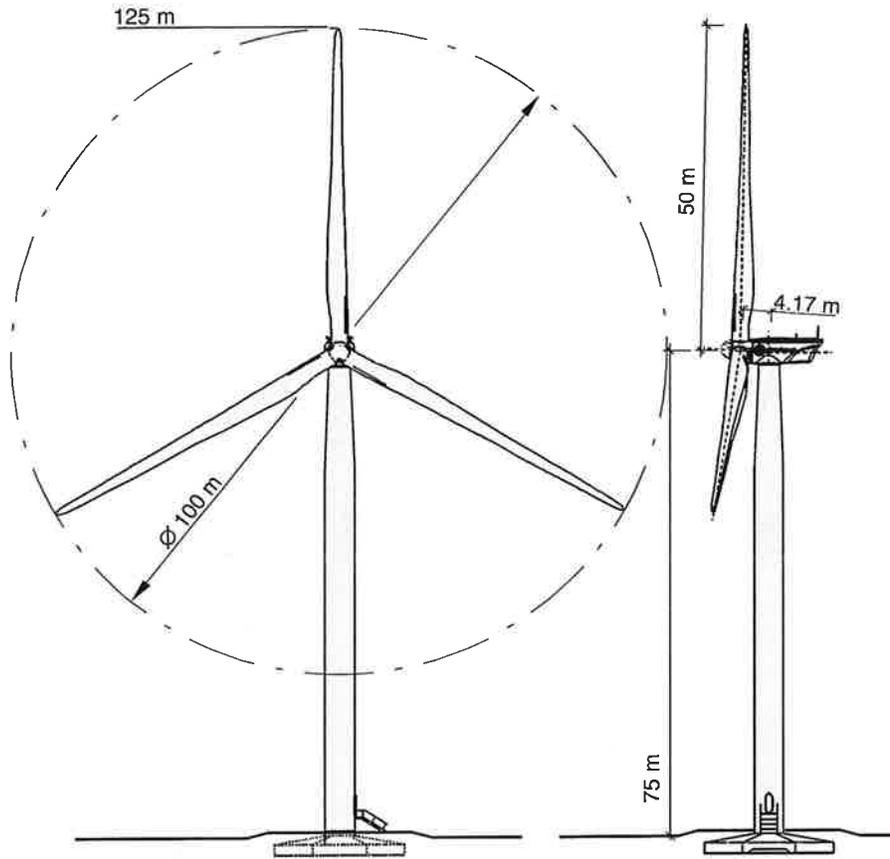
2.5-100 with 75 m hub height and 100 m rotor diameter
